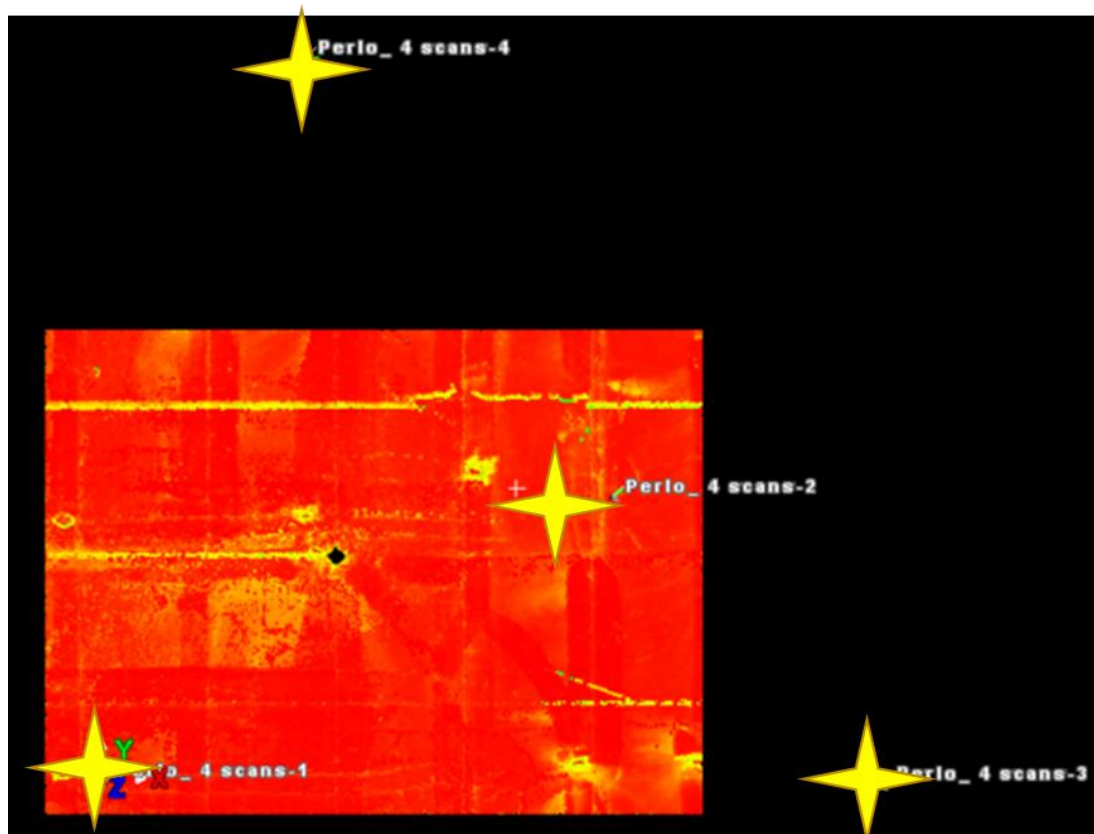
Point cloud data for the concrete slab of the Vista Logistics Park project showing four scan positions.
